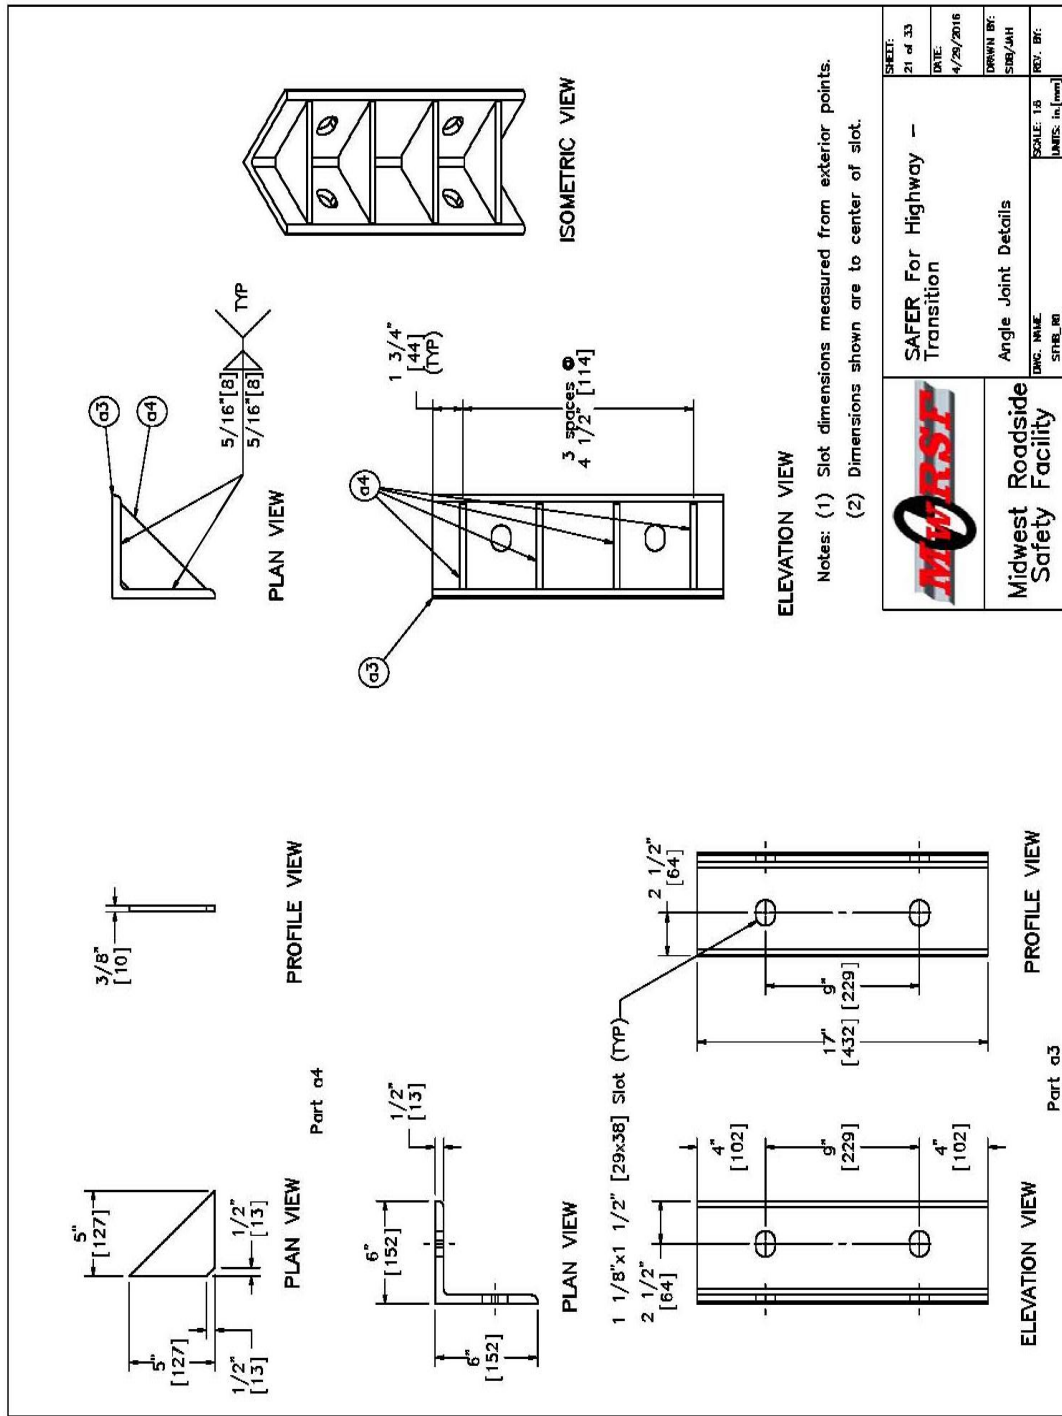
Angle Joint Details, RESTORE Barrier Transition
